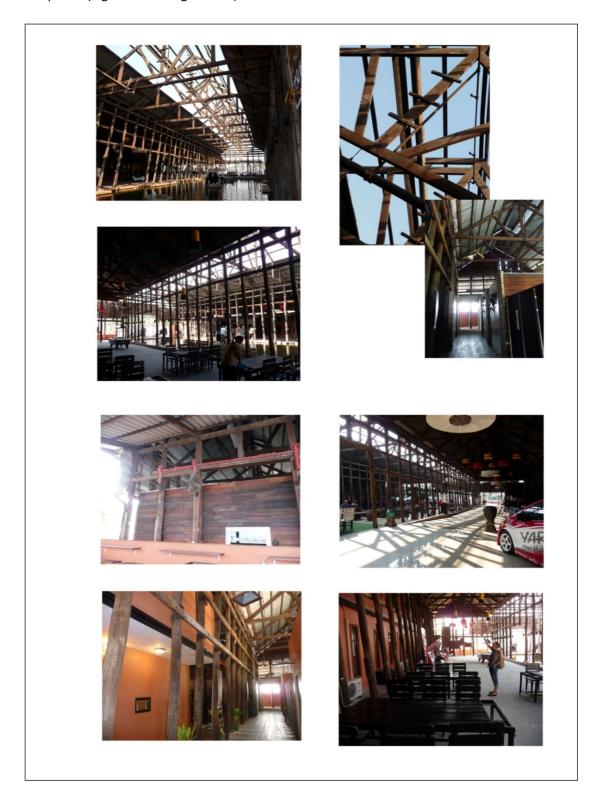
Showing the centre of the building with the exposed roof structure (author)
